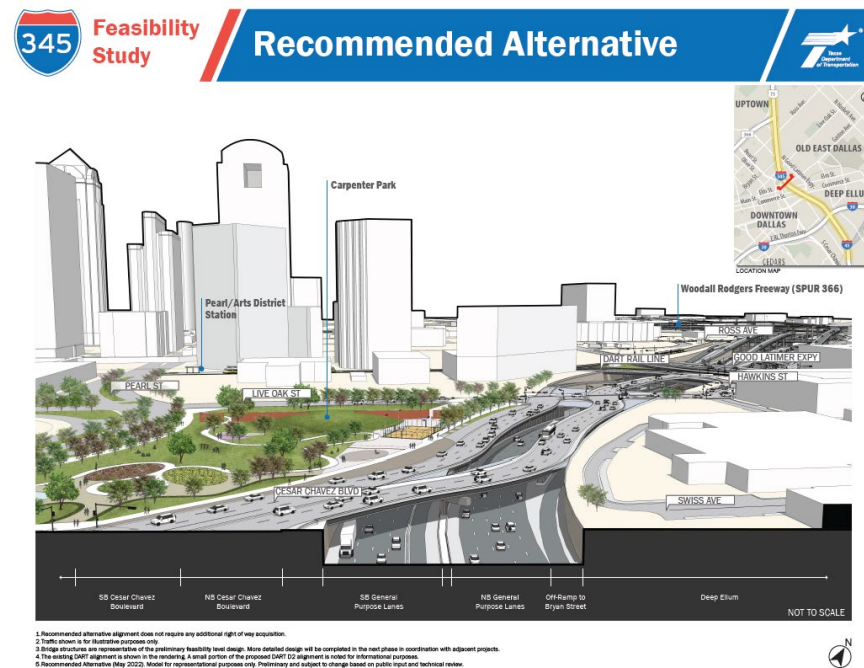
Recommended Alternative 3D Rendering Facing North Towards Cesar Chavez Blvd.
